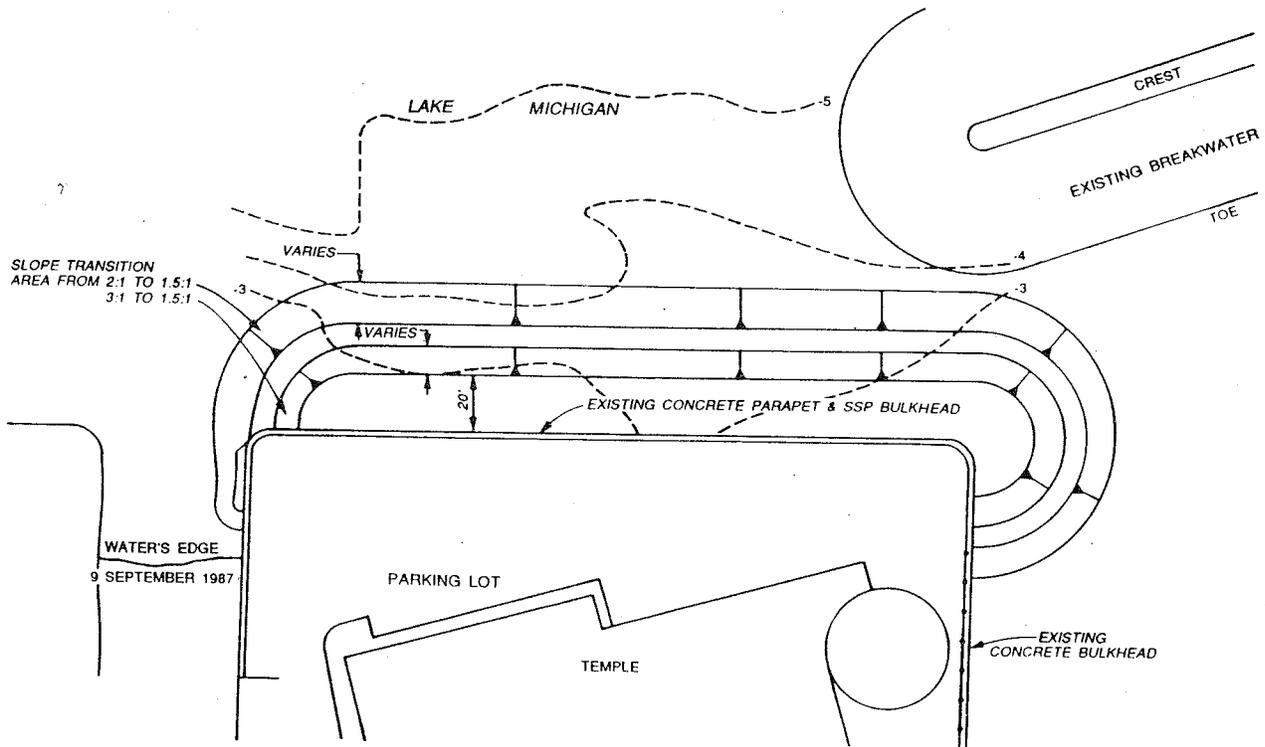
Plan view of Temple Emanuel low-berm revetment-seawall construction
